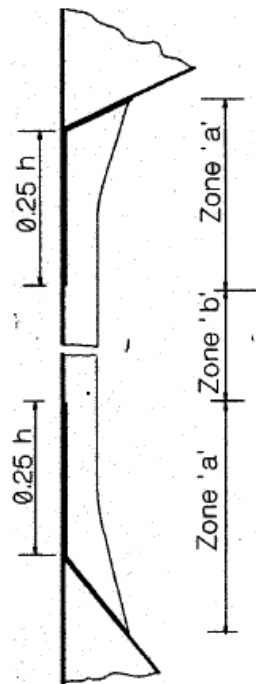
Definition of zones 'a' and 'b' for welding
